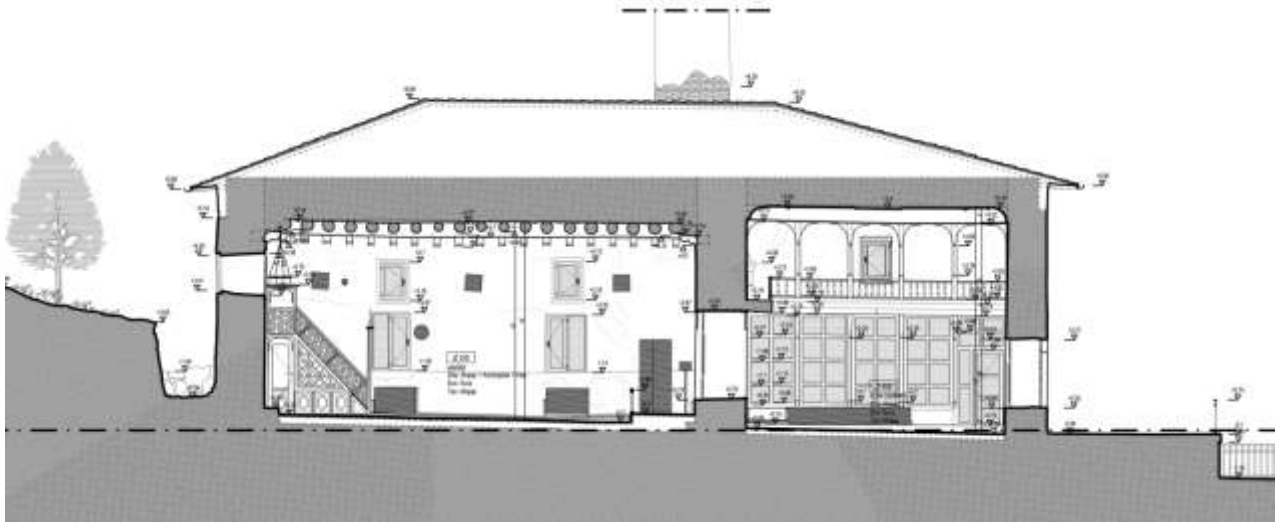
Structure cross-section (drawn by ANB Architectural Office)
